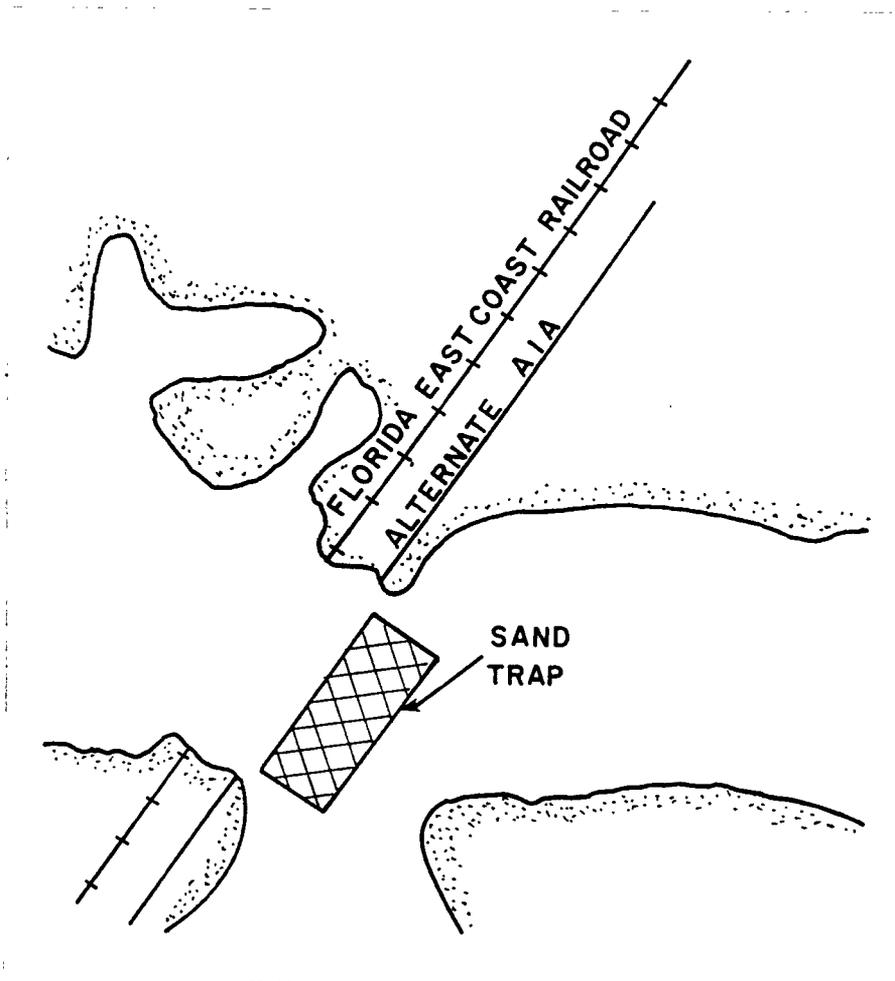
Proposed sand trap east of Florida East Coast Railroad bridge.
